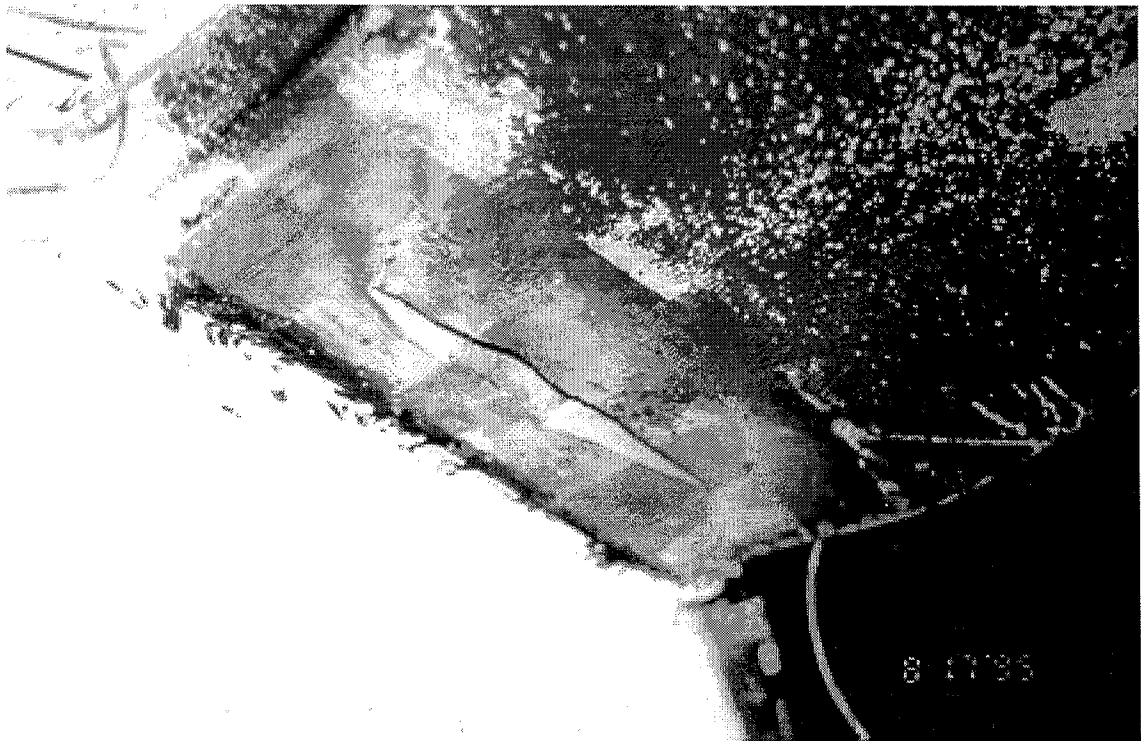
Rupture of Bottom Girder Flange (East Girder of Specimen 1)
